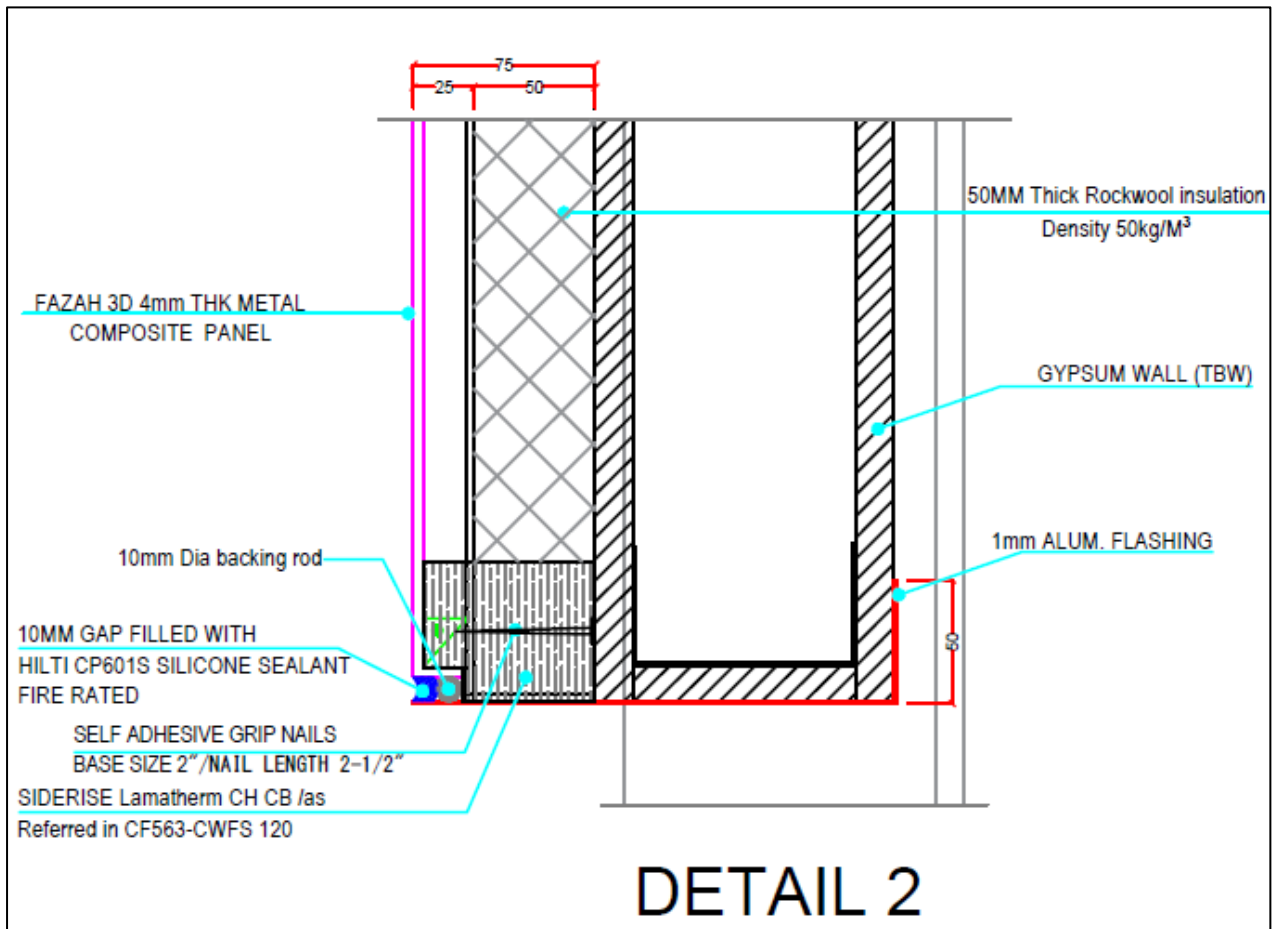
Horizontal sectional detail at the window opening of the specimen.
